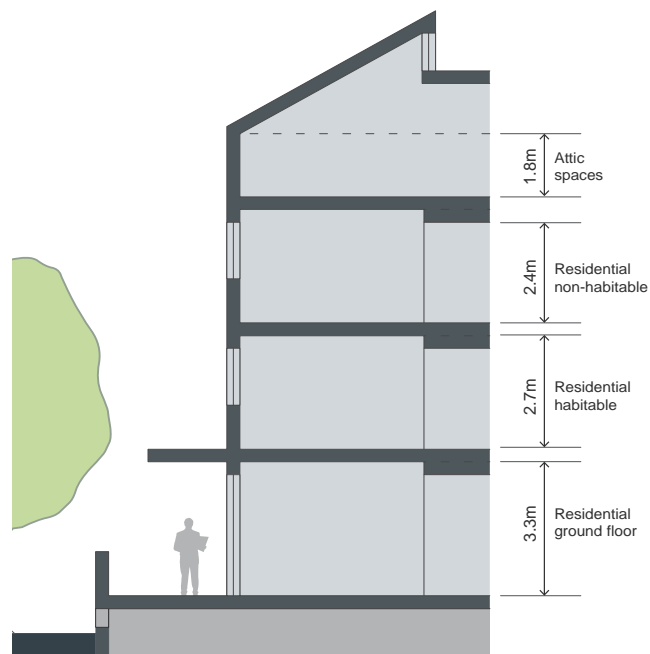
C.2 Ceiling heights of minimum 2.7m help to achieve good daylight access and natural ventilation to residential apartments
